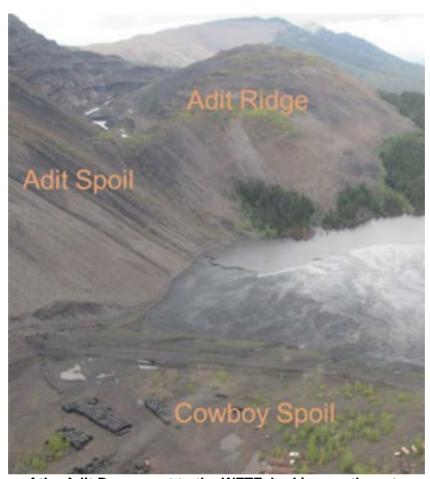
View of the Adit Dump next to the WFTF, looking northwest
